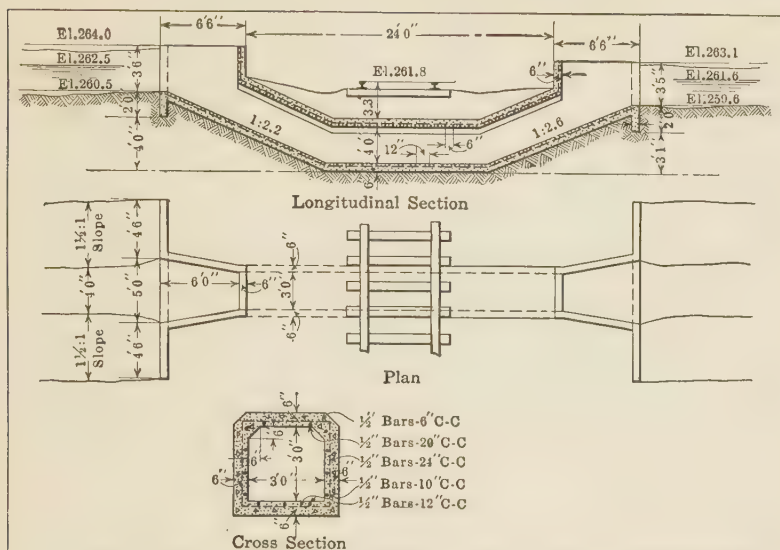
B.—Reinforced concrete box culvert for railway crossing. Orland Project, Calif.
